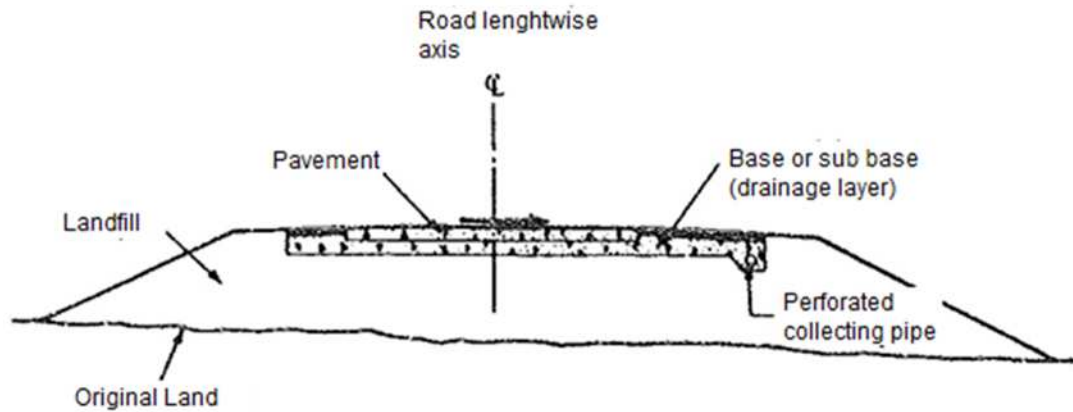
Lengthwise collecting drain used to remove water percolating to the structural pavement section (Garber & Hoel, 2007).
